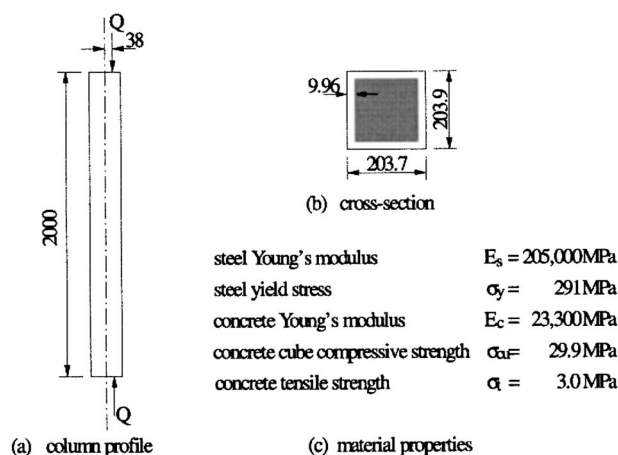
Concrete-filled steel box column tested by Bridge (1976)
